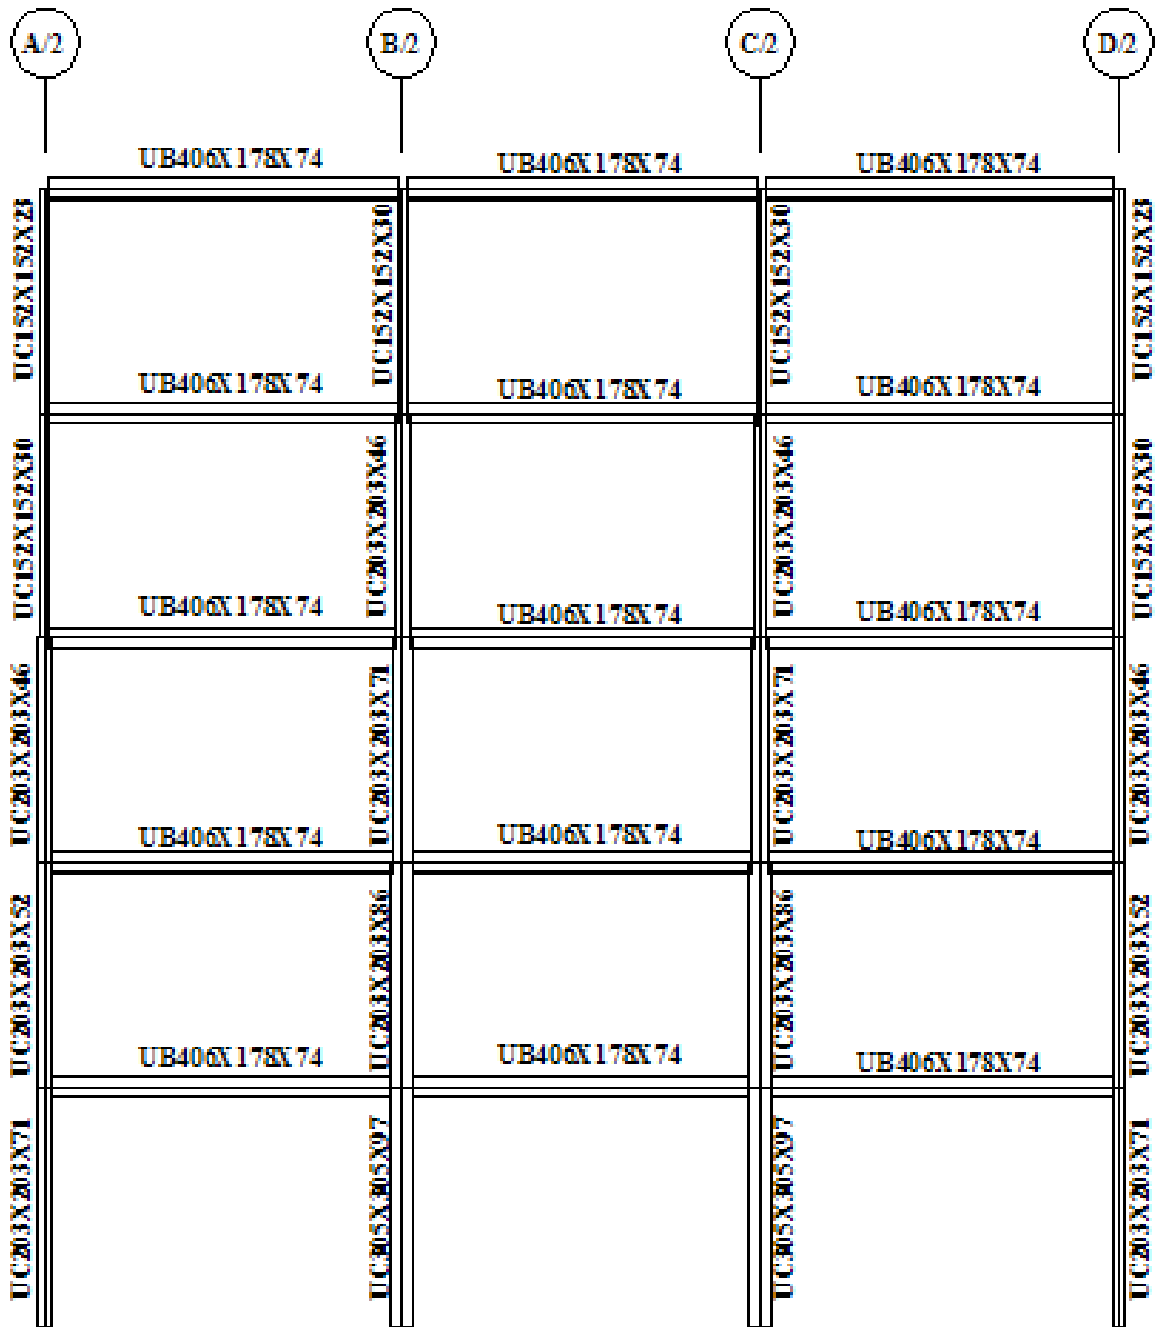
(b): Design result of symmetrical plan and section with RHS brace steel profile, section 2_2.
